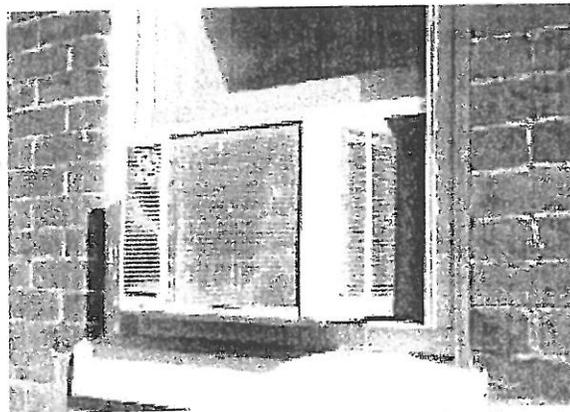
Window air conditioners should be installed only on secondary elevations--preferably on the rear or side of a building--and should never damage historic building materials.
